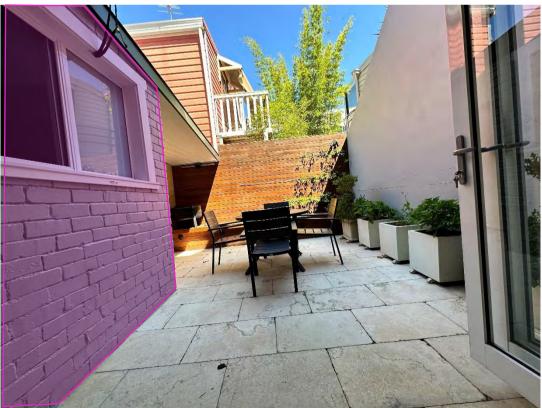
Open rear courtyard area with roofed clothes drying area and lower ground floor bathroom (shaded in pink)
